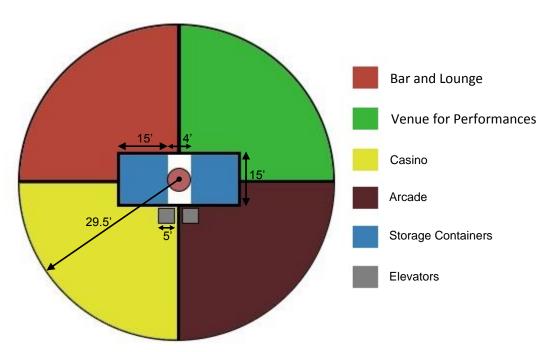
Entertainment Area Floor Plan of Elevator Cab
